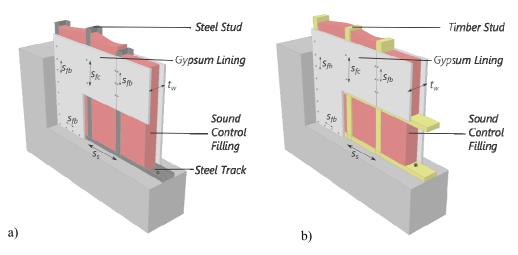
a) Typical steel framed drywall detail (i.e. FIF1-STFD), b) Typical timber framed drywall detail (i.e. FIF2-TBFD)-Note: Refer to Table 1 for dimensions.
